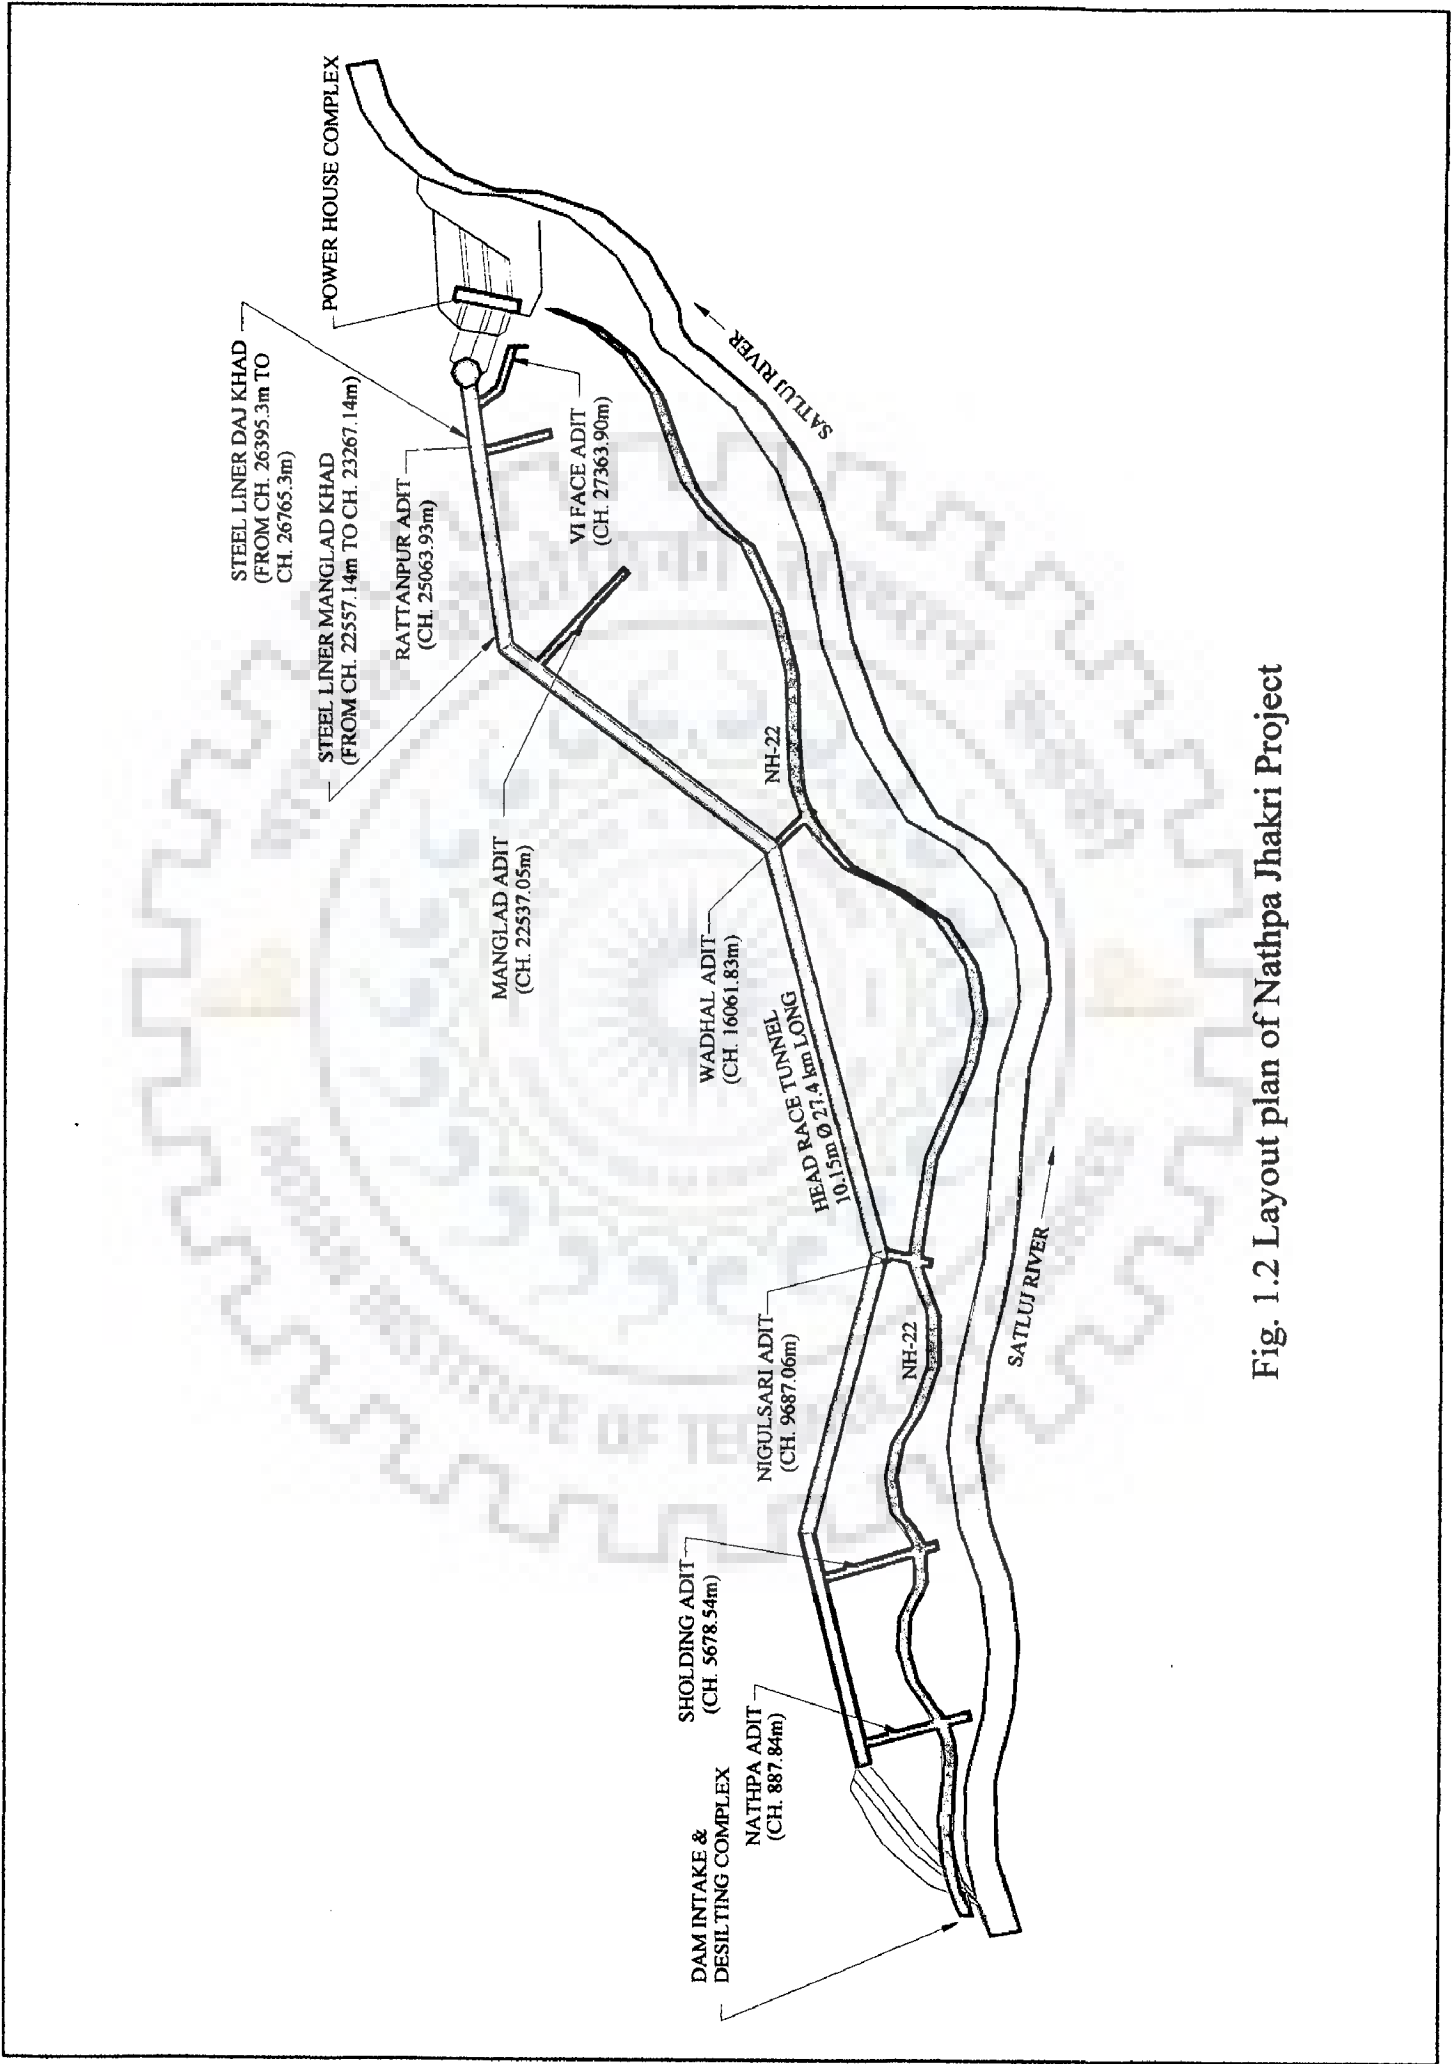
Layout plan of Nathpa Jhakri Project
